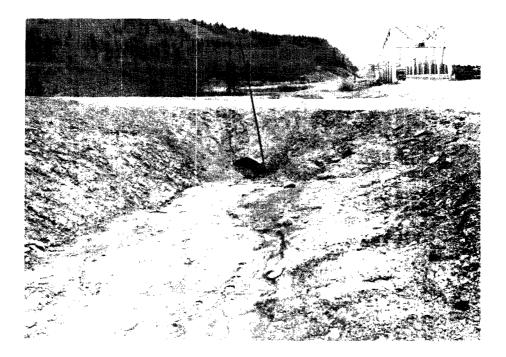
Lack of rip-rap and under-sized, poorly maintained culvert in approach to Yukon River, Alaska Highway, km 1444. Reconstructed section.
